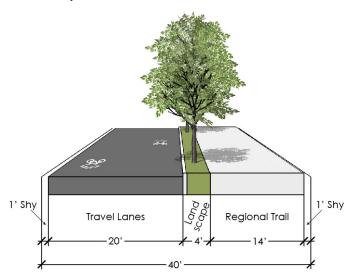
illustrates an alternative cross section providing a landscape buffer between the roadway and regional trail – increasing level of separation and decreasing level of traffic stress. Under this cross-section alternative, the regional trail facility is located on one side of the roadway and no walking accommodations are provided on the opposite side.
